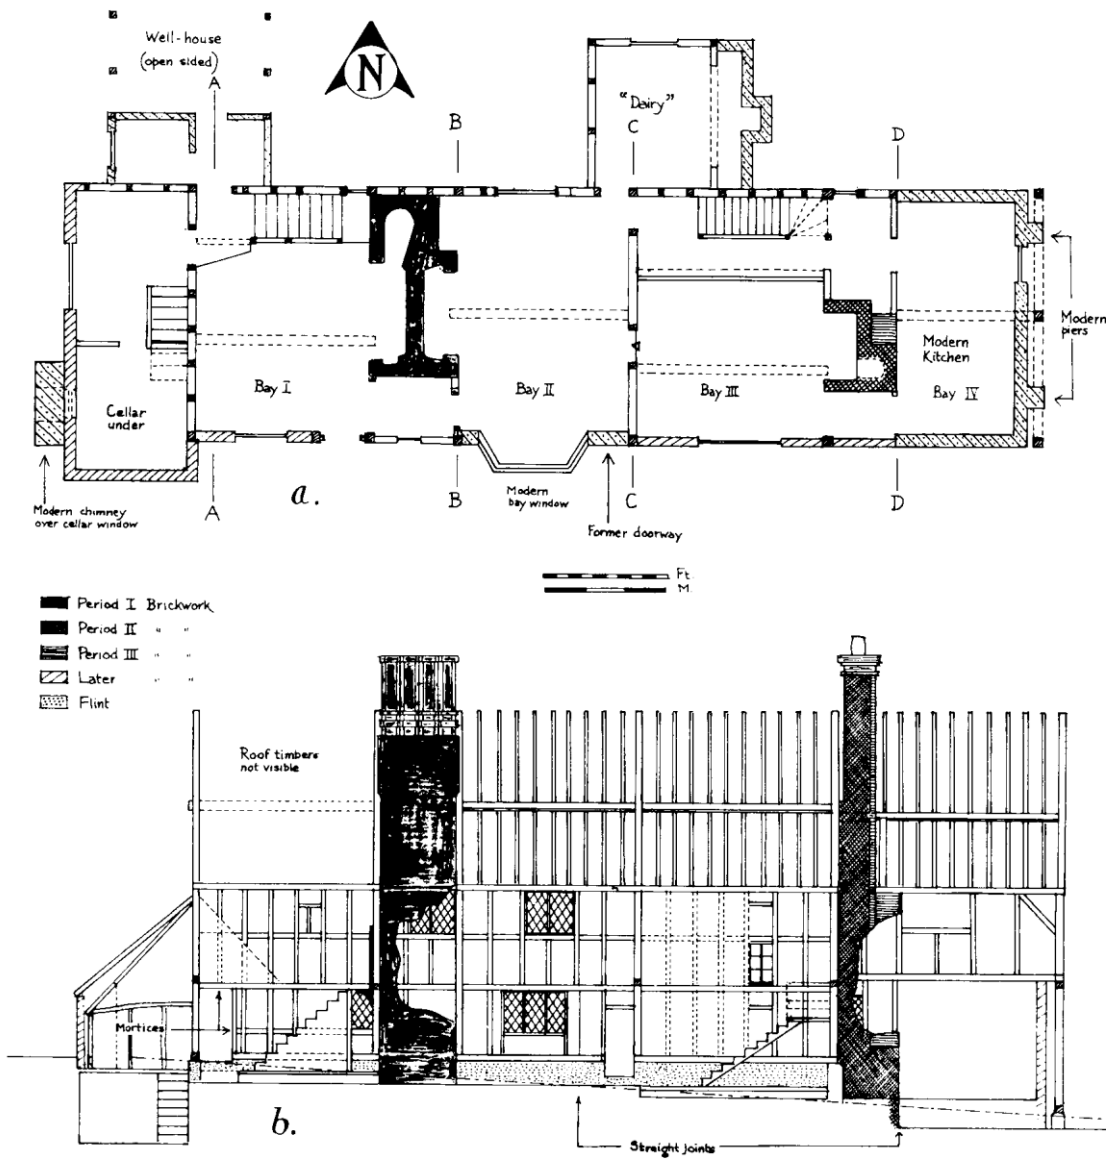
Bowers Farm, (a) Ground-floor plan, (b) Cut-away view, looking north. Bay IV was added in 1686 as a gate-house over the entry into the farmyard.
